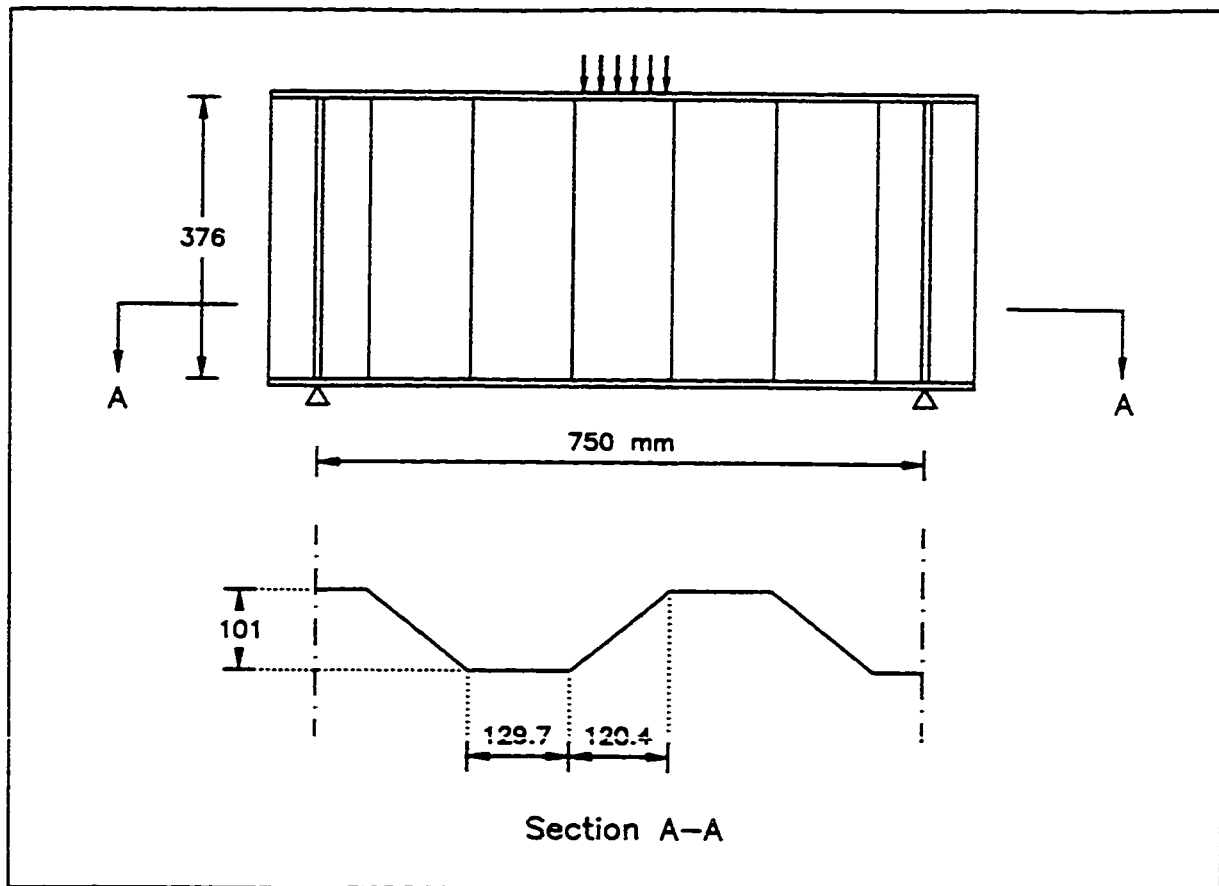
Geometry of test specimen for partial edge loading tests, [ref. 11]
